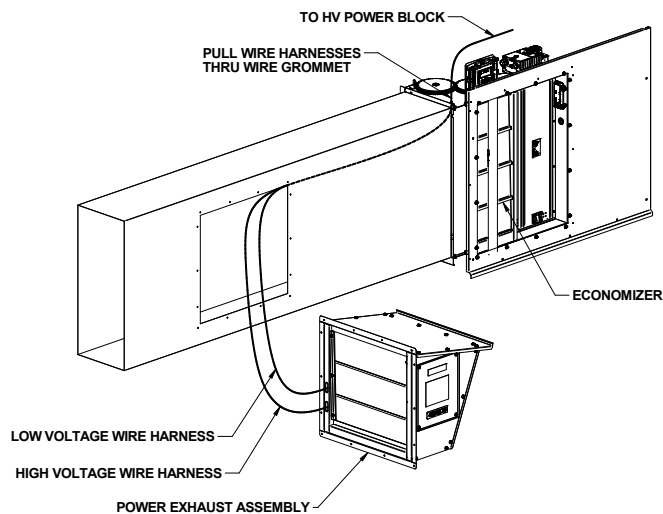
3-6 Ton Power Exhaust Wiring
